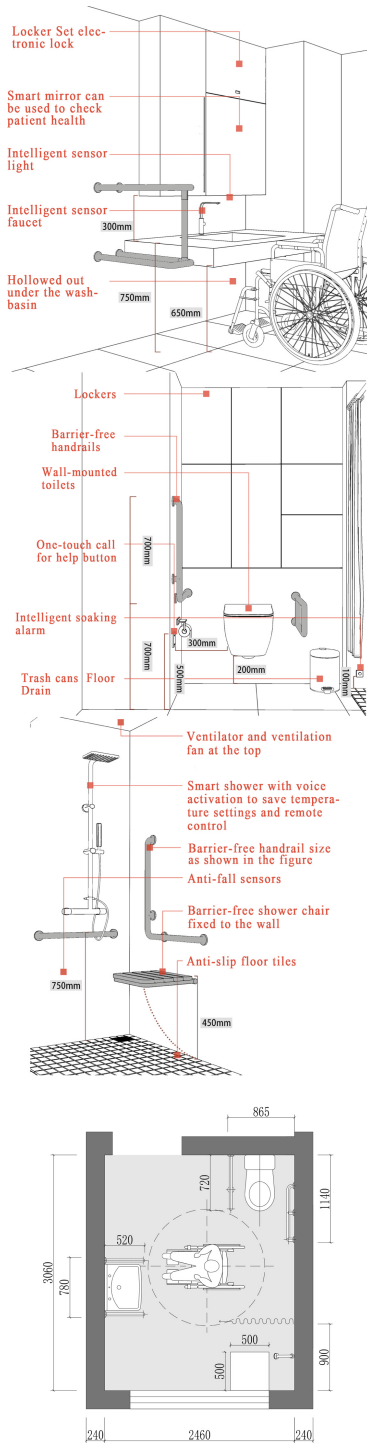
Bathroom shower accessibility data and overall bathroom floor plan
